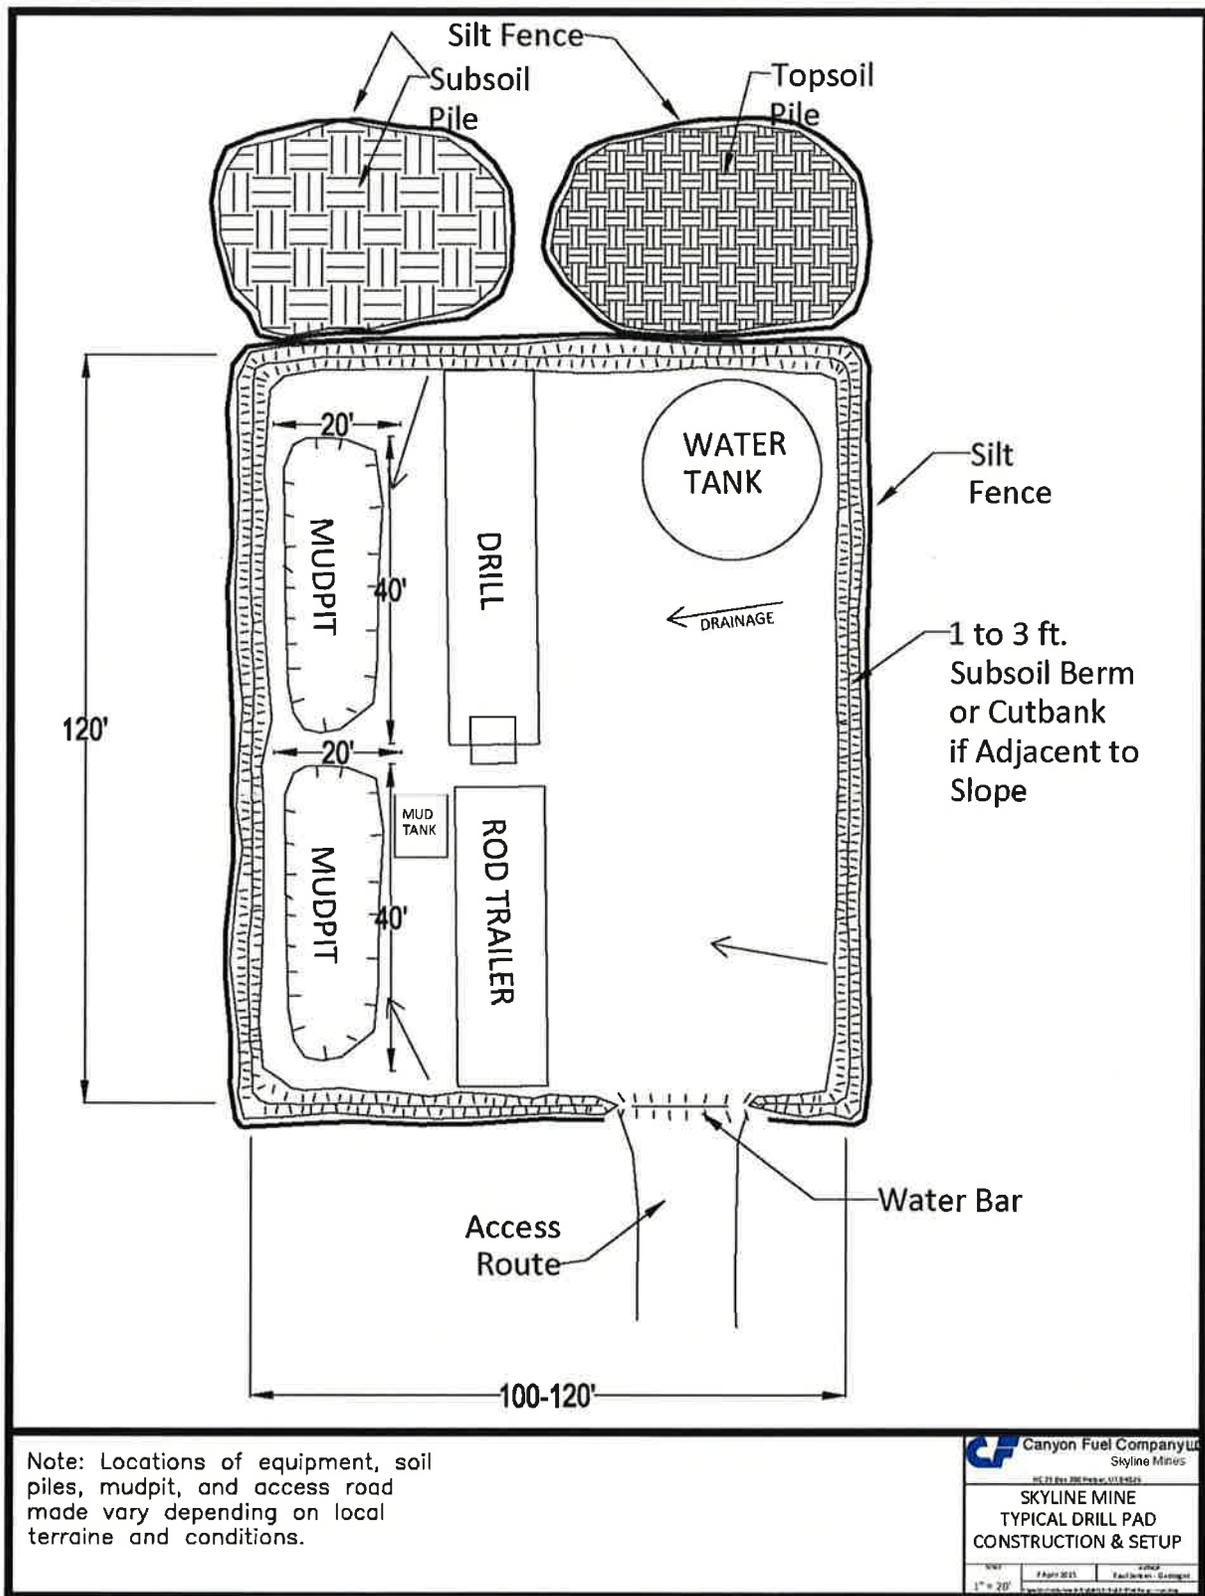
Typical conventional drillsite setup. Note: The berm will be constructed of excavated mudpit material or imported material.
